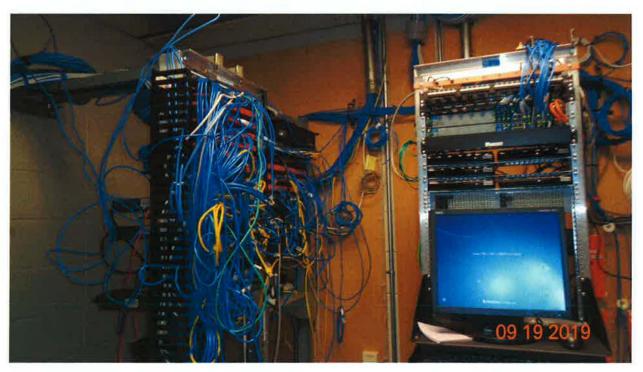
One of the MCG Racks is not Bonded to the Grounding System
